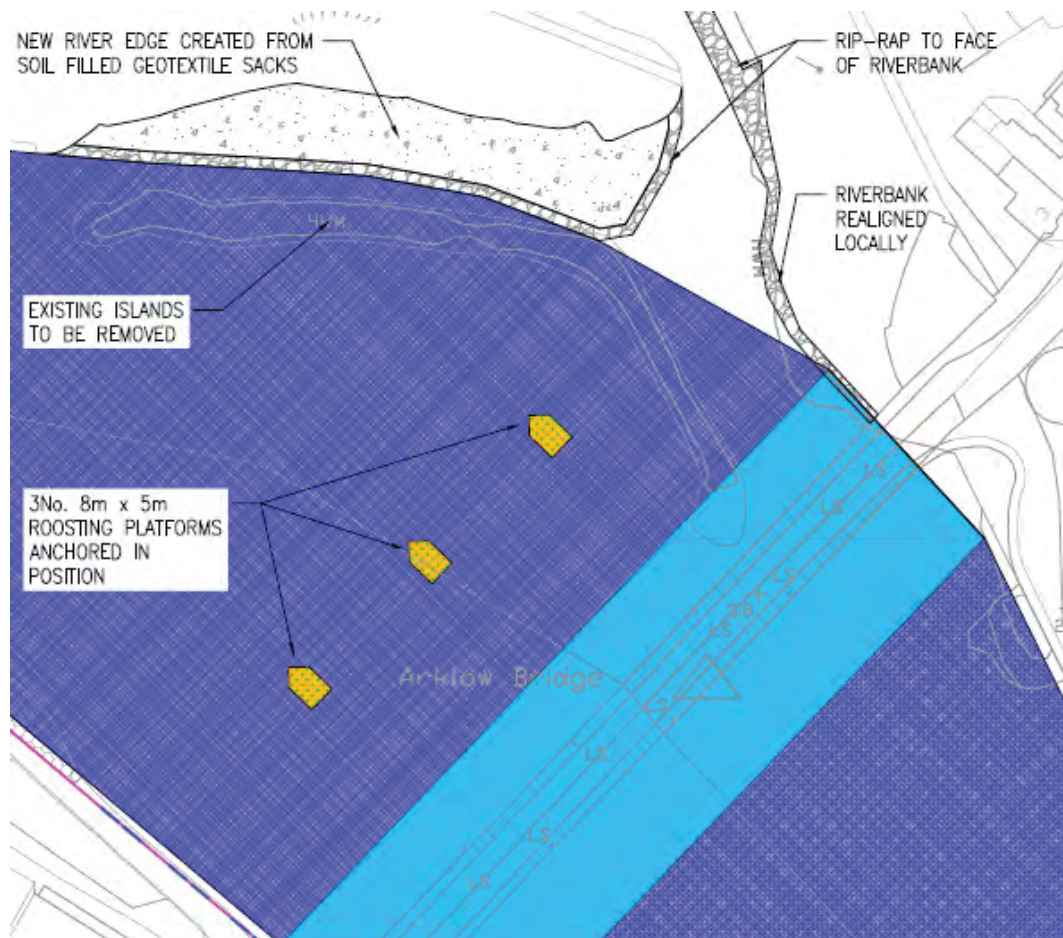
Extension of North Bank and Roosting Platforms Upstream of Arklow Bridge (extracted from Drawing No. 1003) Not to scale.
